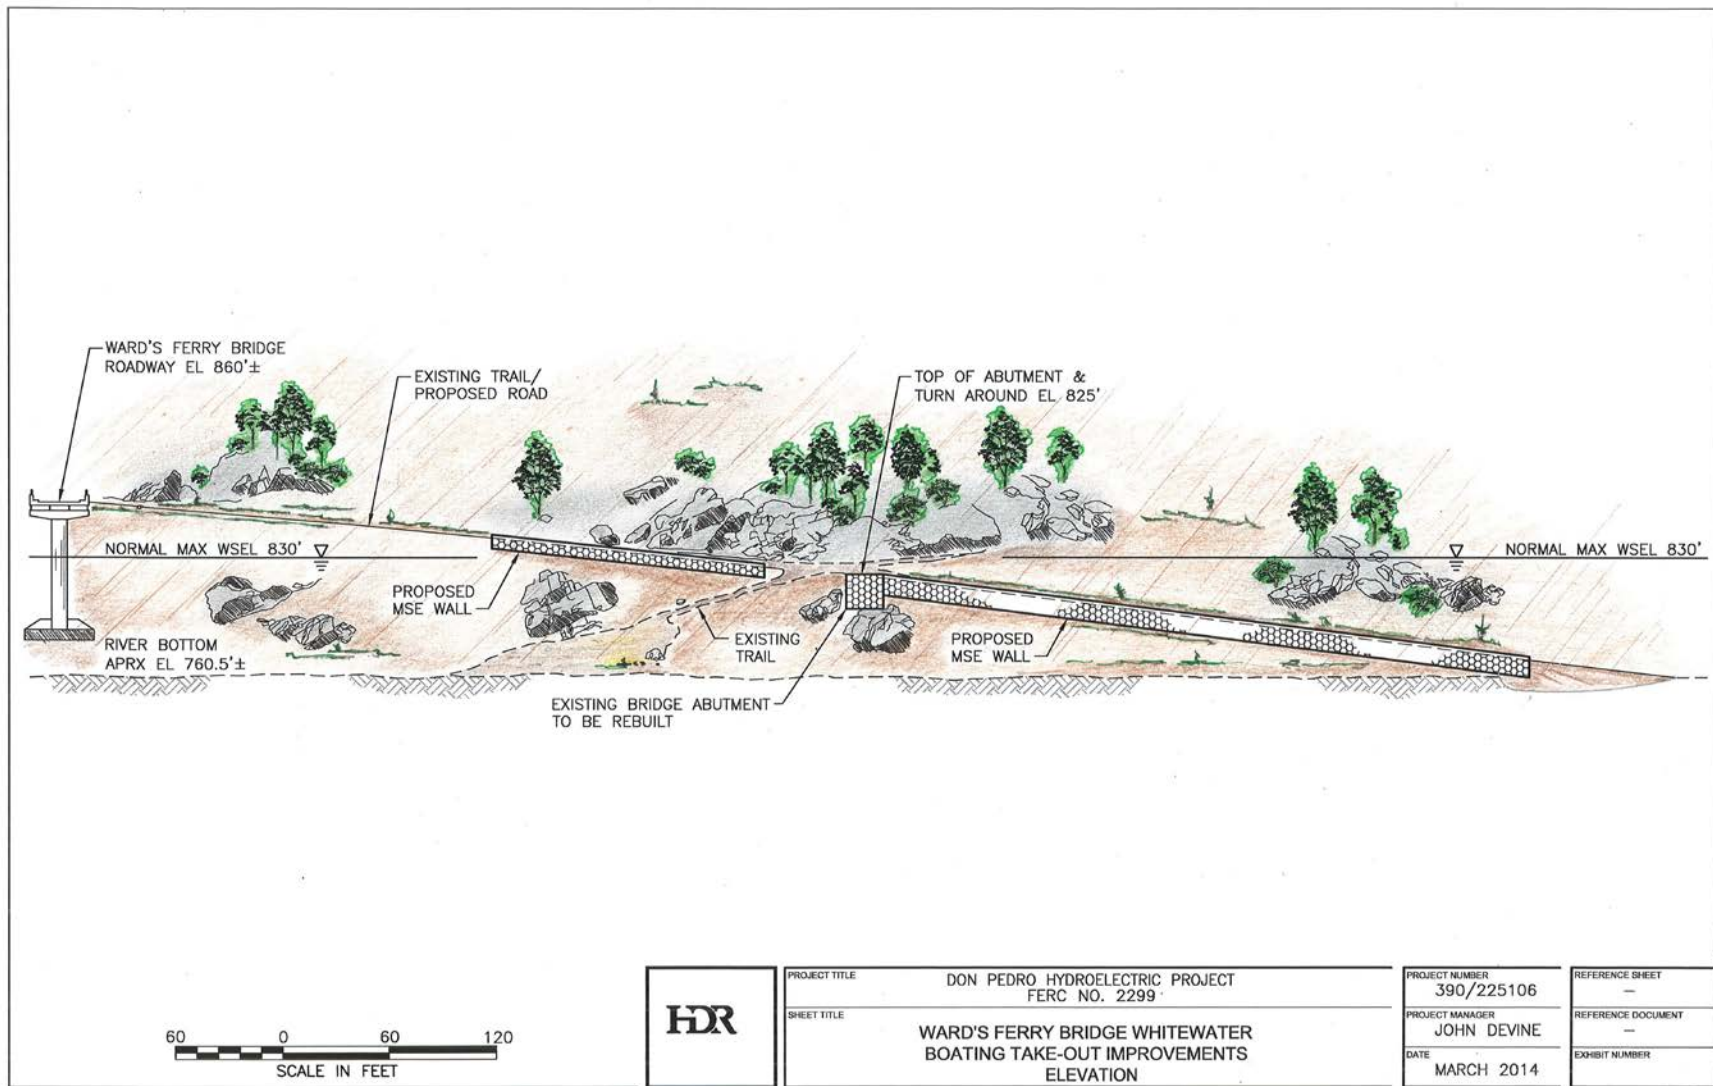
Ward's Ferry bridge whitewater boating take-out improvements – elevation view.
